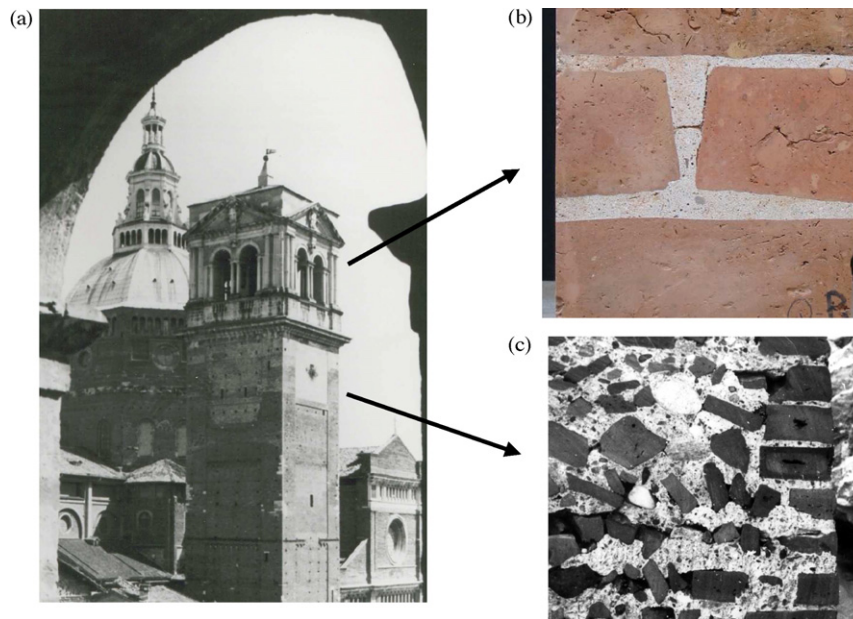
(a) Civic Tower of Pavia; (b) XVI cent. plain and (c) medieval rubble masonry.
